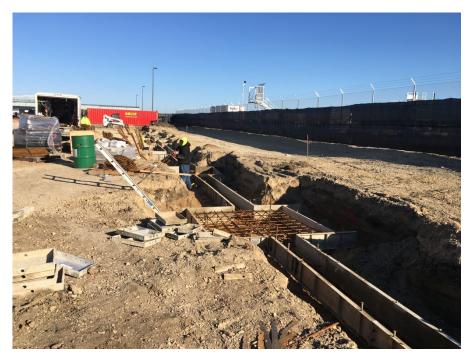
Initial groundwater treatment system setup, looking southeast (3/16/21; 13:21)
